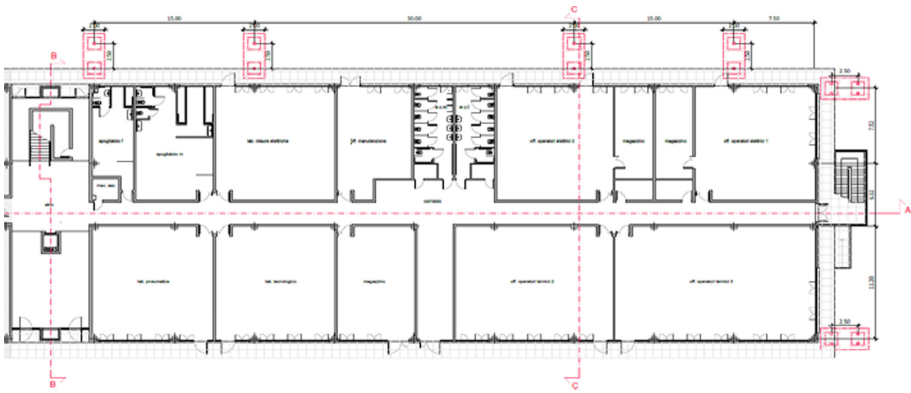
Plan of the building with external bracings foundations in red. Dimensions in m.
